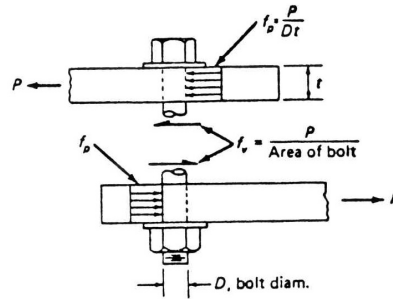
Forces assumed acting on a bearing-type connection.
